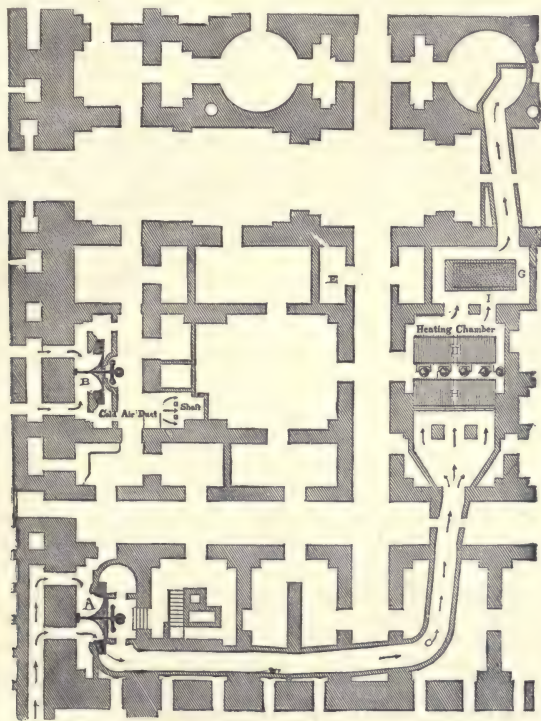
PLAN SHOWING AIR DUCTS, ETC., IN CONNECTION WITH HEATING APPARATUS, SOUTH WING, U. S. CAPITOL.
